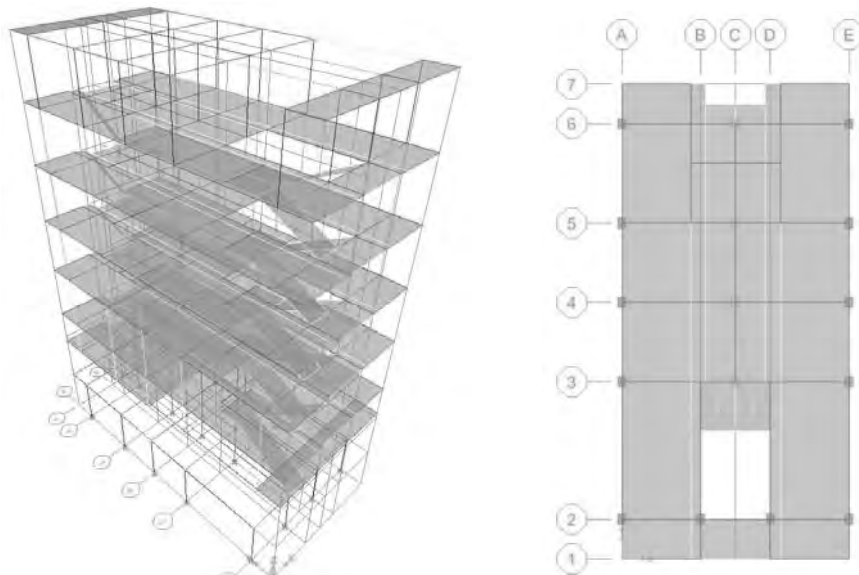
3D view and floor plan of structural model for 6 stories with 2 unit apartment
